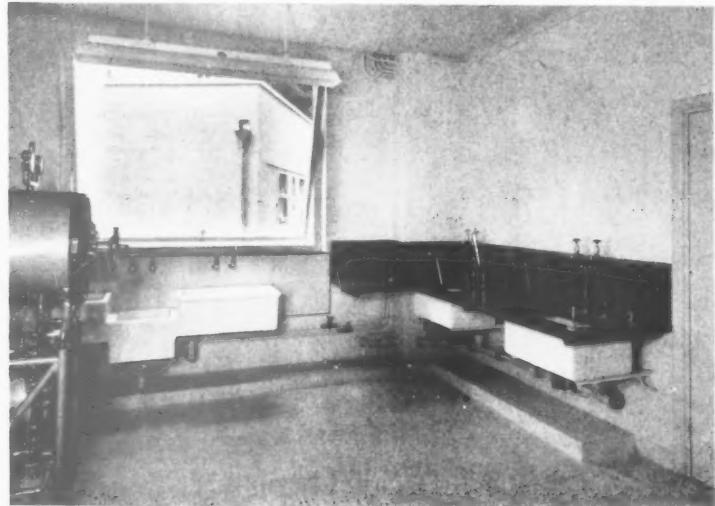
DETAIL OF TYPICAL BENCH SINK AND WASTE BIN
